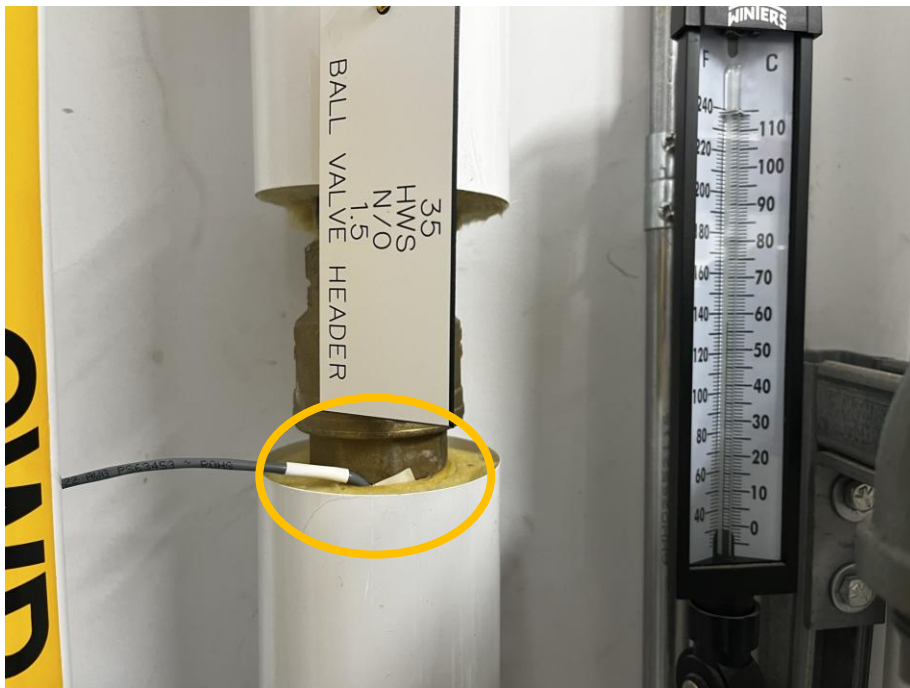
An example of completed thermistor installation after pipe insulation has been re-installed.
